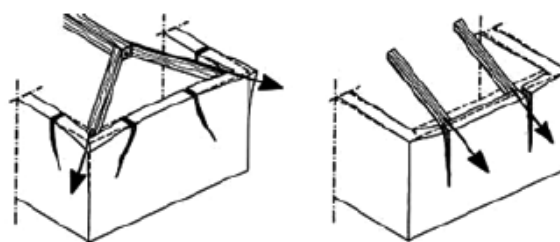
Hammering of the roof on the load bearing walls, (Doglioni, 1999)
